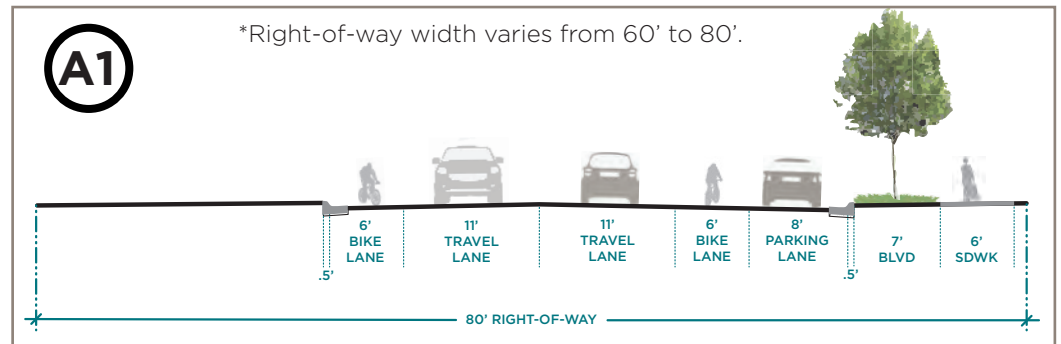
Alternative A Typical Section - East Broadway Segment Looking East
